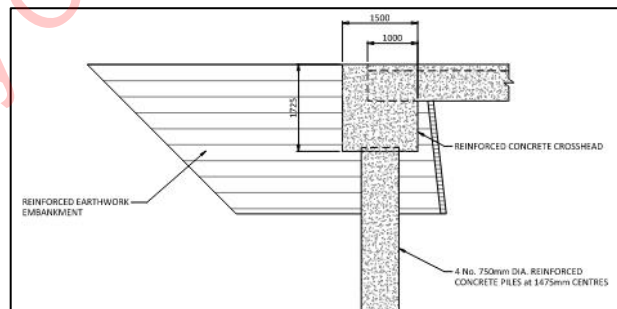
Proposed Pedestrian / Cycle Bridge (Integral Abutments)
